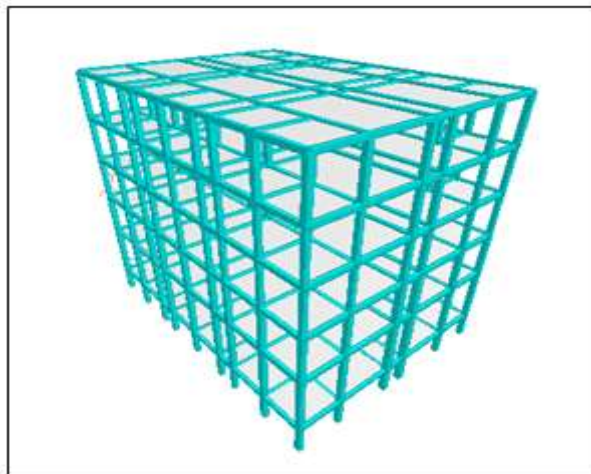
G+4 Dimensional Rendered View of Reinforced Frame
